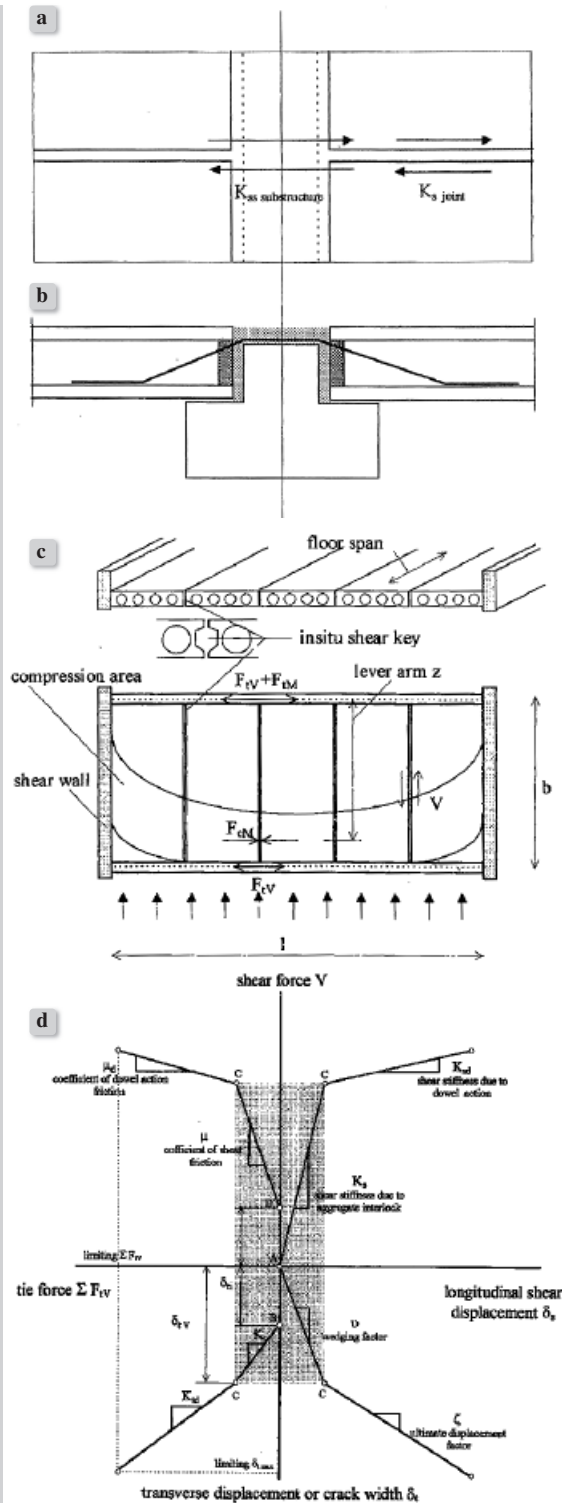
Calculation model of a precast floor diaphragm [7] and [6] a) b) beam fulfilling the function of a shear member c) plan of a floor diaphragm d) constitutive relationships between shear force  $V$ , transverse tie force  $\Sigma F_{TV}$ , longitudinal slip  $\delta_s$  and transverse displacement  $\delta_t$
